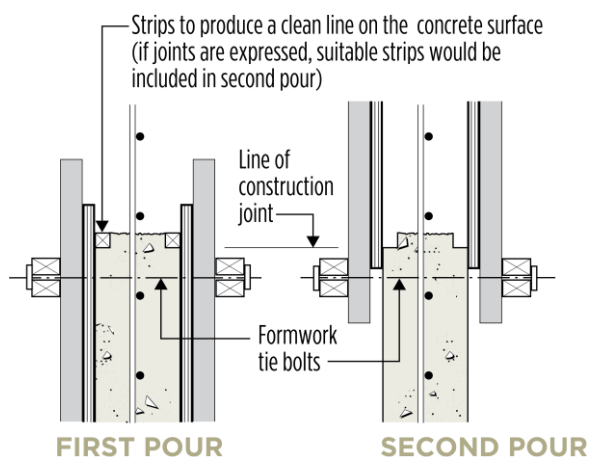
Horizontal Construction Joint in a Wall when a Clean, Neat Line is needed
